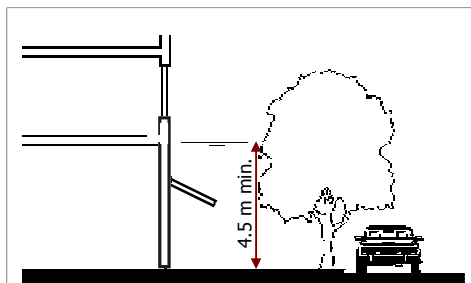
The ground floor of retail and commercial uses will have a minimum height of 4.5 m.
